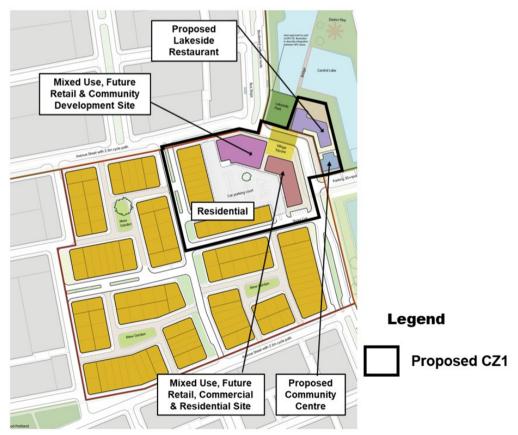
Extract from approved development plan with extent of the site to be rezoned overlayed
